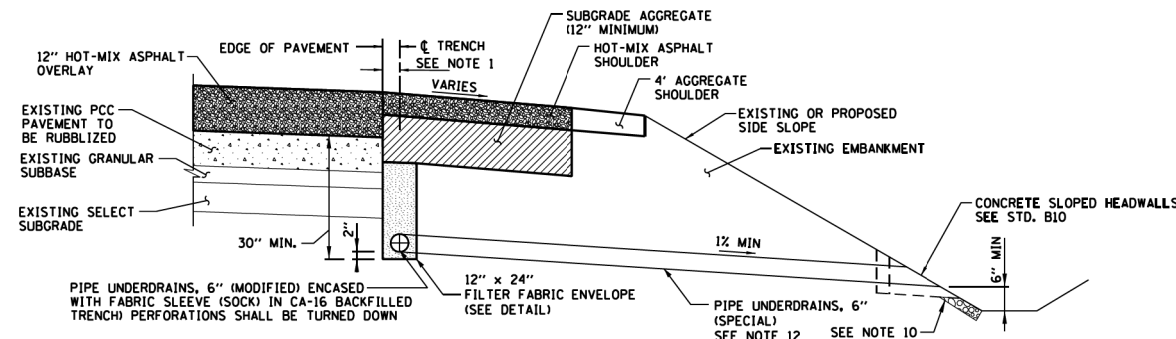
DETAIL OF PIPE UNDERDRAIN, 6"
